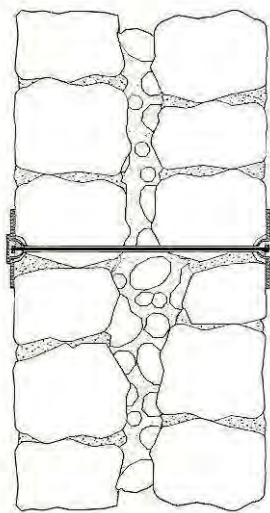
Strengthening of a masonry wall with steel connectors (27)
